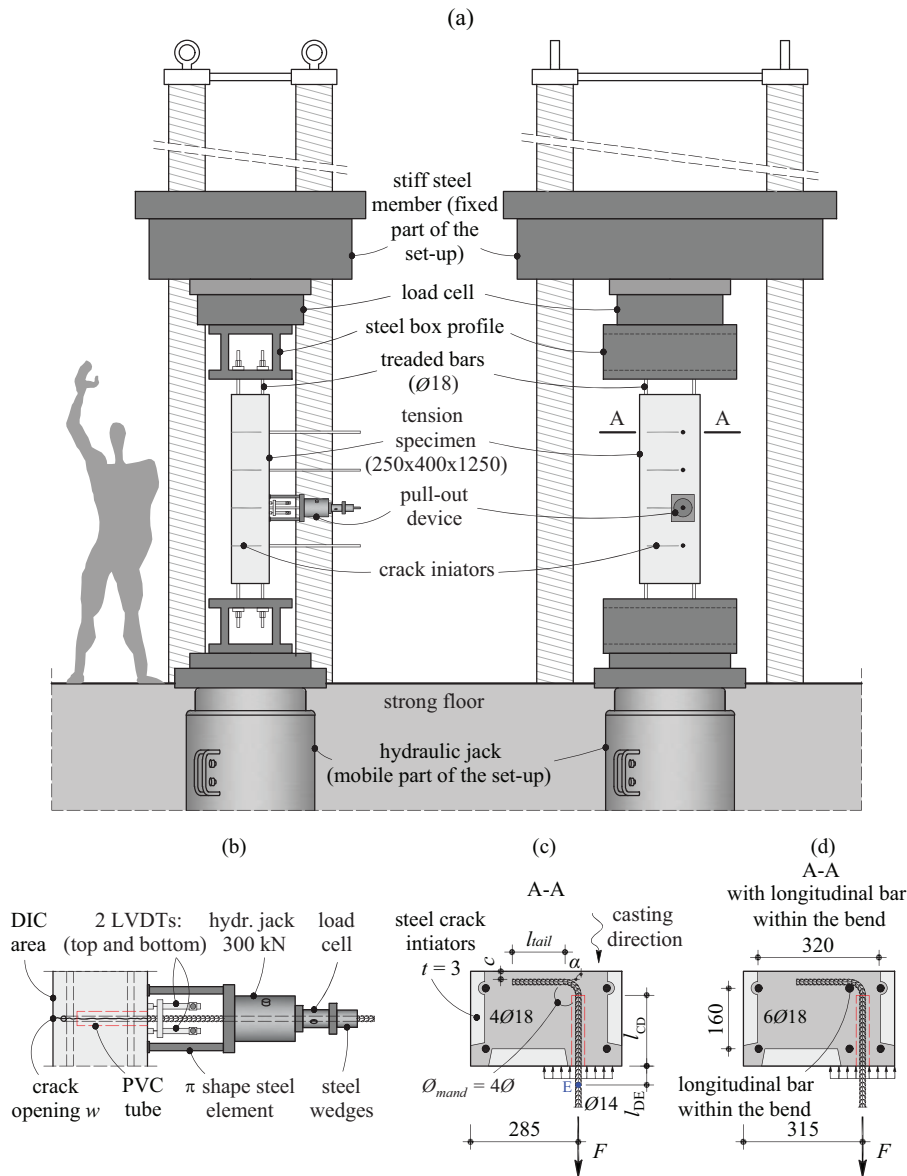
Geometry of specimens and test set-up for the anchorages tested under cracked conditions: (a) test setup; (b) pull-out device; and (c) cross sections of the specimens; and (d) cross sections of the specimens with longitudinal bar within the bend. (points E refers to the points where the displacement δ_E represented in Figure 3.9 is measured, dimensions in [mm]).
